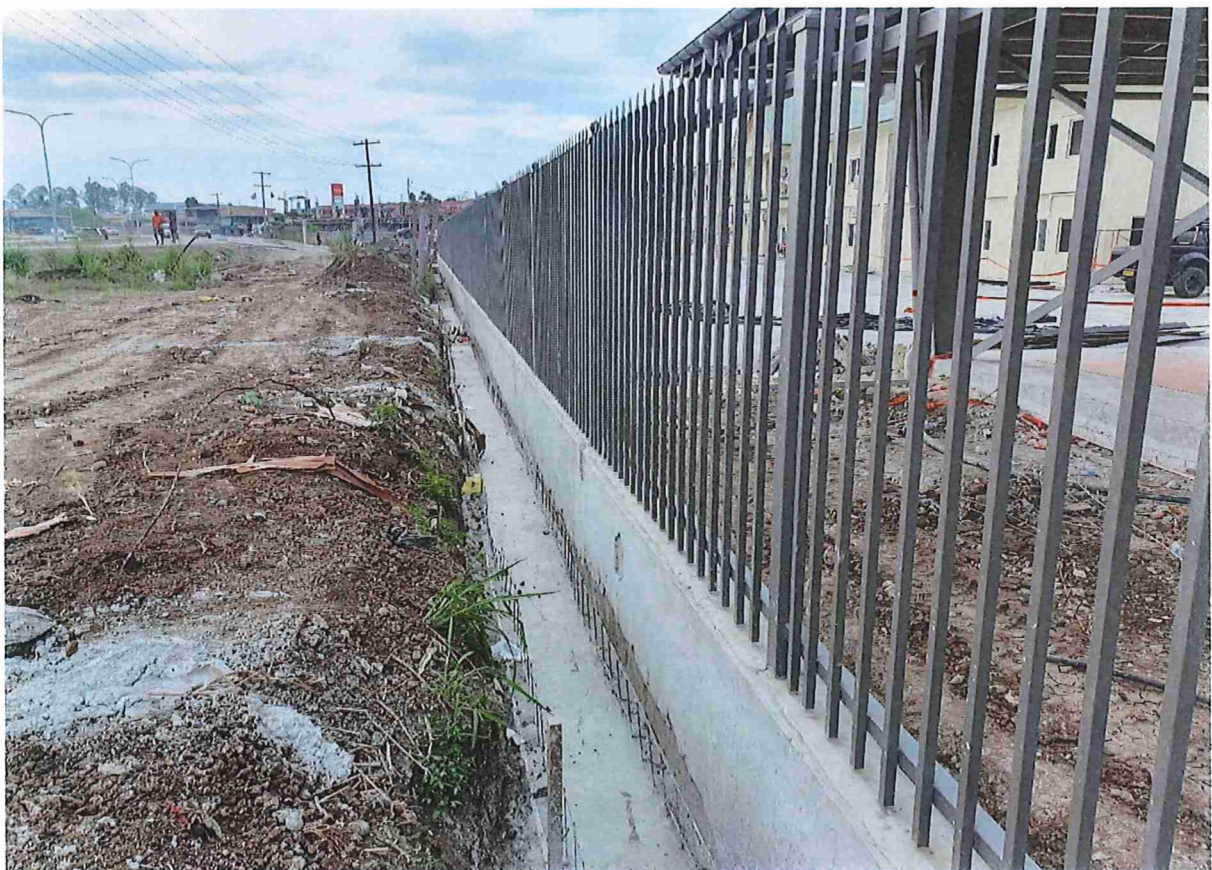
Storm water drainage (Southeast end) – concrete blinding to base
